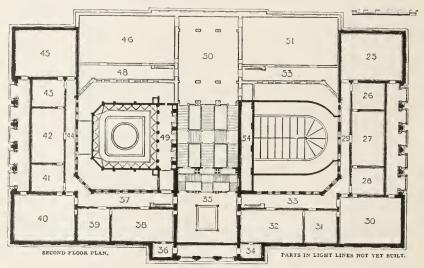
Art Institute of Chicago. Second-floor plan.
